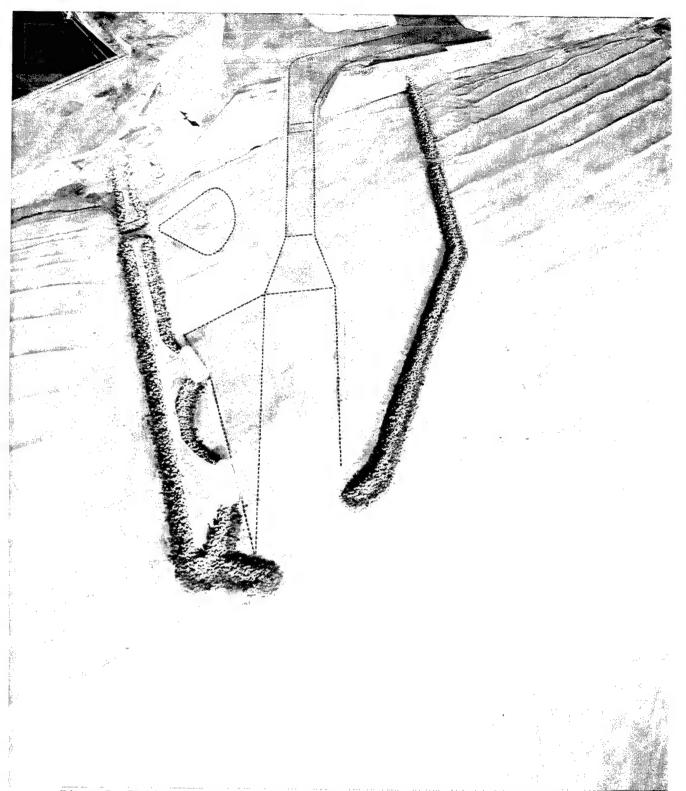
Typical wave patterns for Plan 19; 12-sec, 1-m (3.3-ft) waves from 182 deg; swl = +0.5-m (+1.6-ft)
